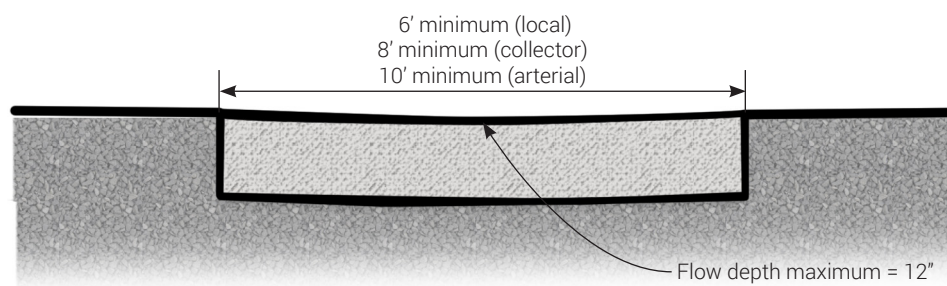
TYPICAL SECTION FOR VALLEY GUTTER
